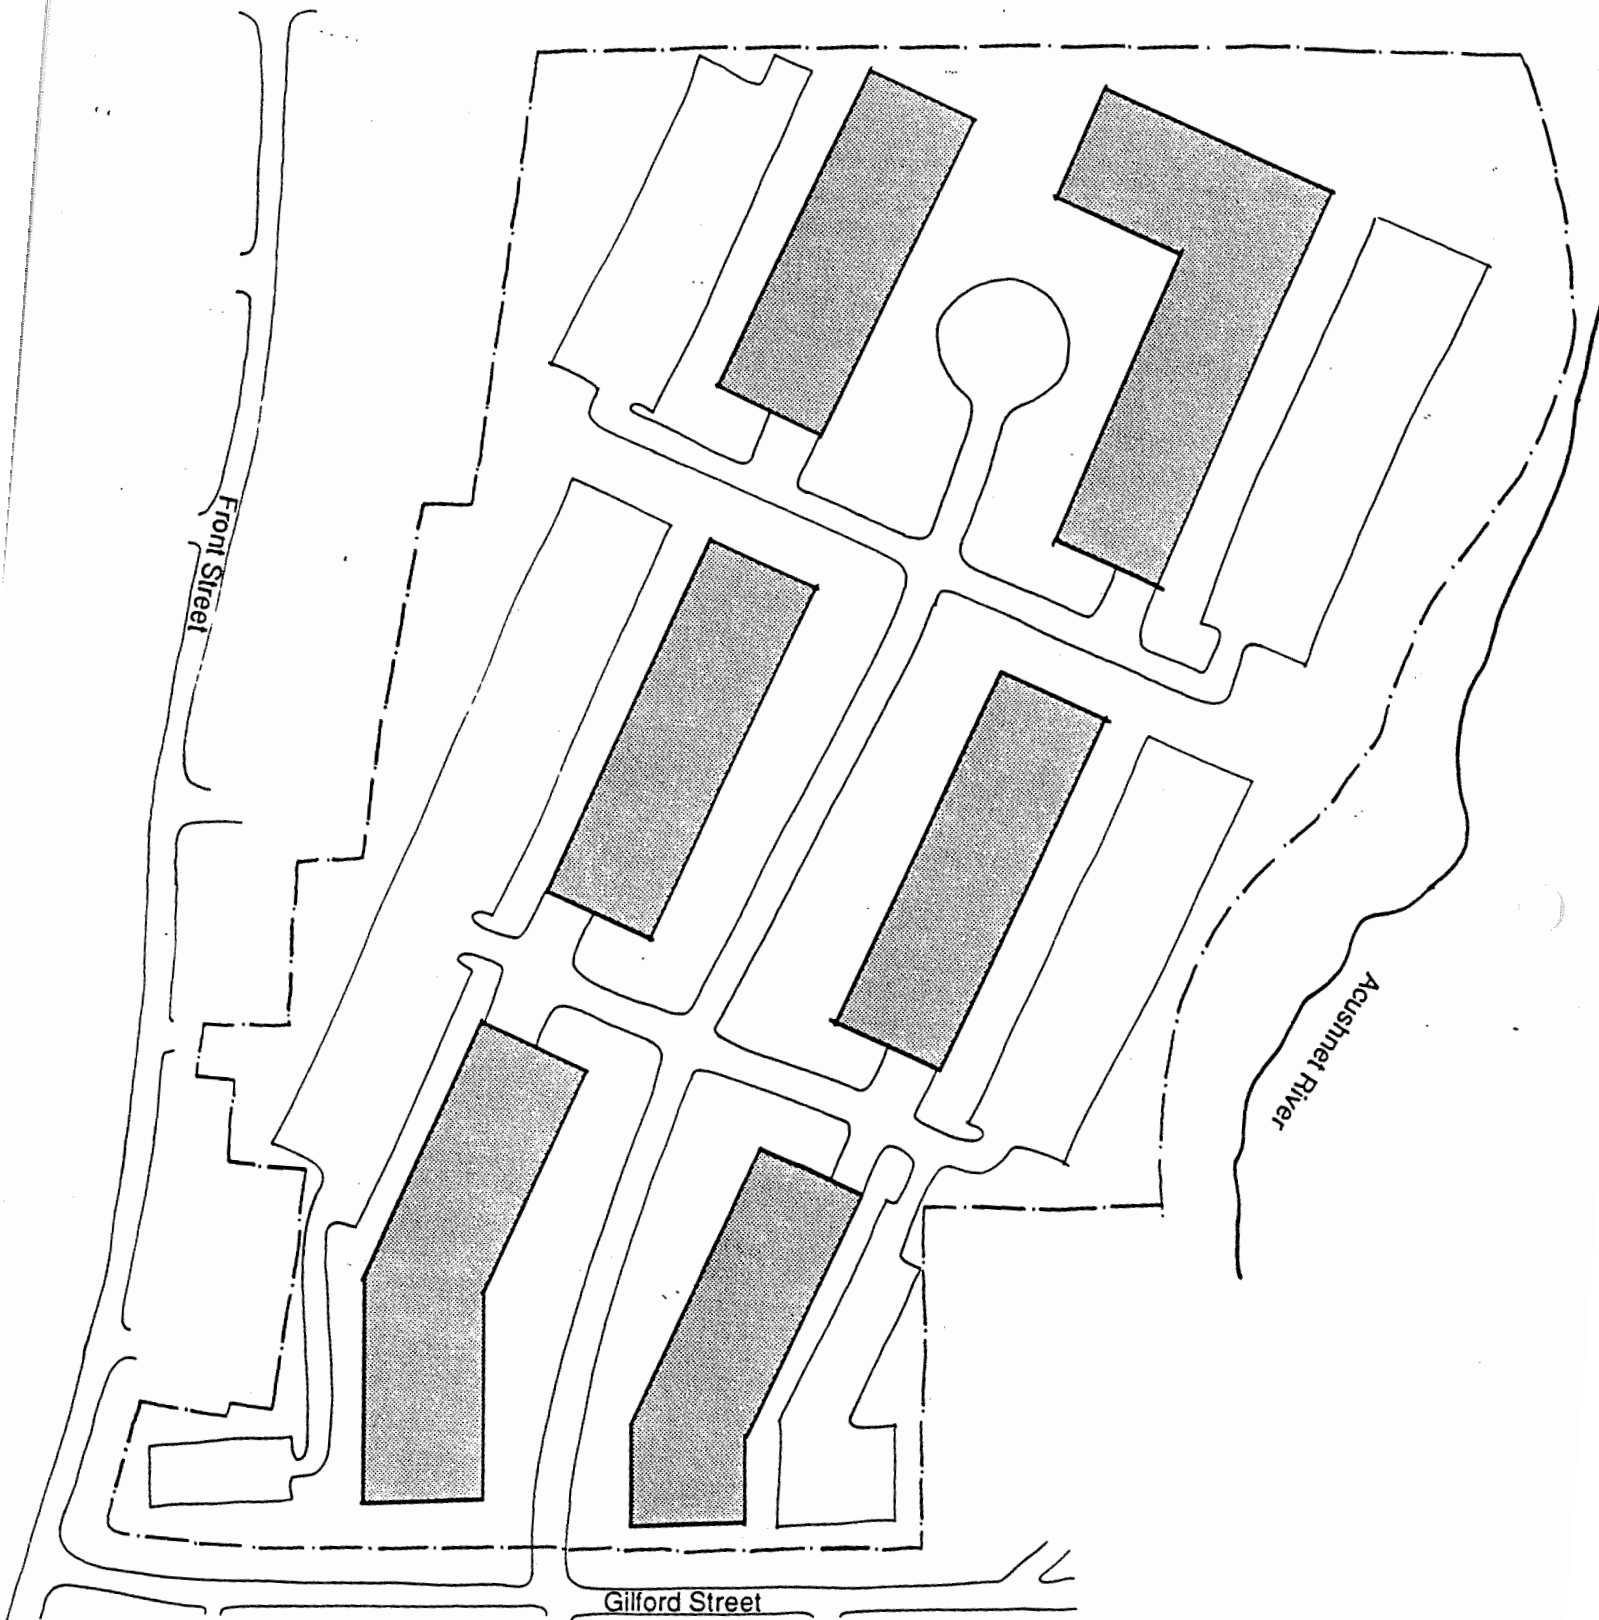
Illustrative Site Plan of Industrial Use on Site 4A
